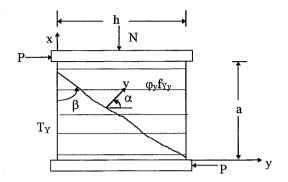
Failure mechanism of a shear wall with horizontal stirrups subjected to transverse loading
